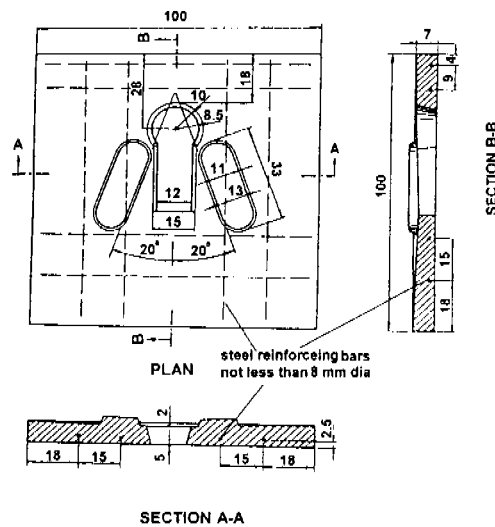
Square, reinforced, concrete squatting slab of a simple pit latrine
